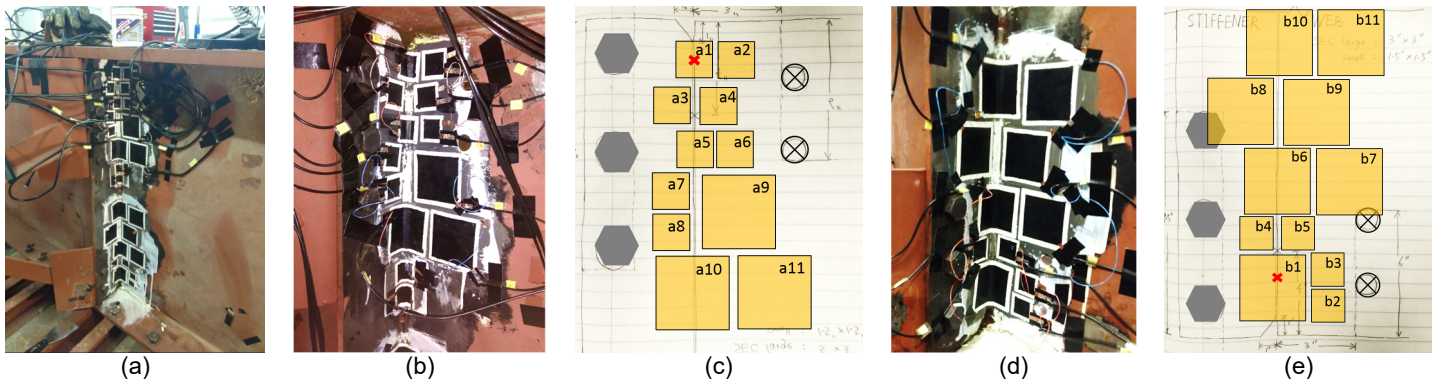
(a) An overview of the bridge girder to cross frame connection; (b) top of the connect; (c) sensor arrangement map at top of the connection; and (d) bottom of the connection; and (e) sensor arrangement map at bottom of the connection
